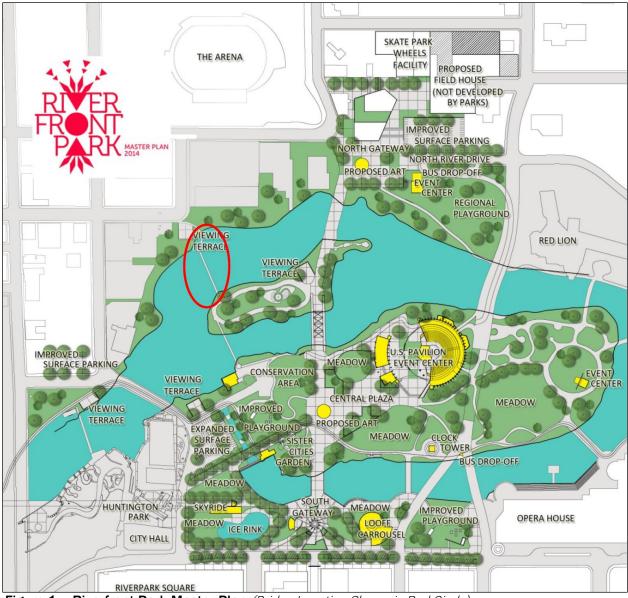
Riverfront Park Master Plan (Bridge Location Shown in Red Circle)
